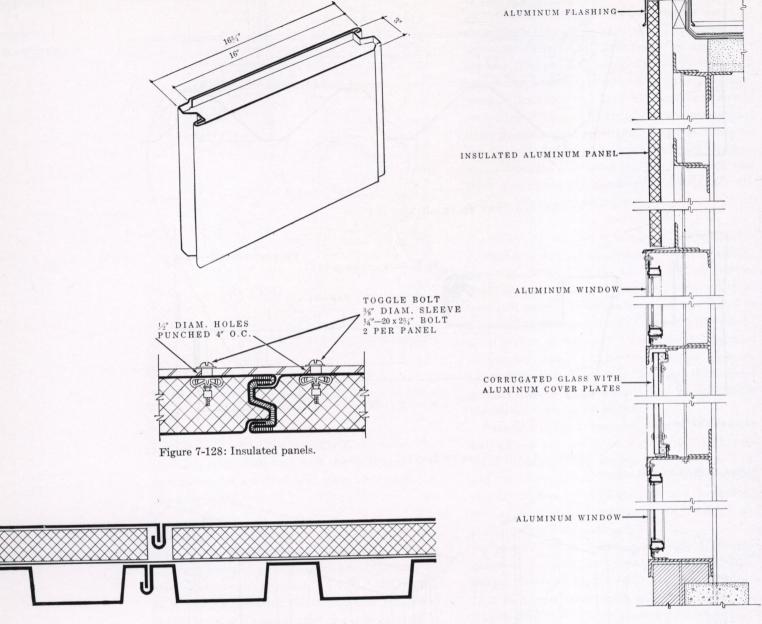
The Q-panel in cross section, and a wall built up with it.
